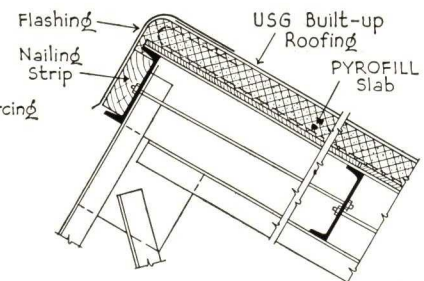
DETAILS OF SHEETROCK-~PYROFILL SYSTEM
